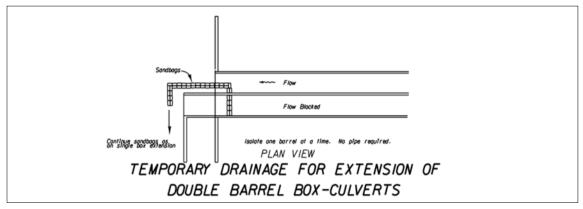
Temporary Drainage for Extension of Double Barrel Box-Culverts
